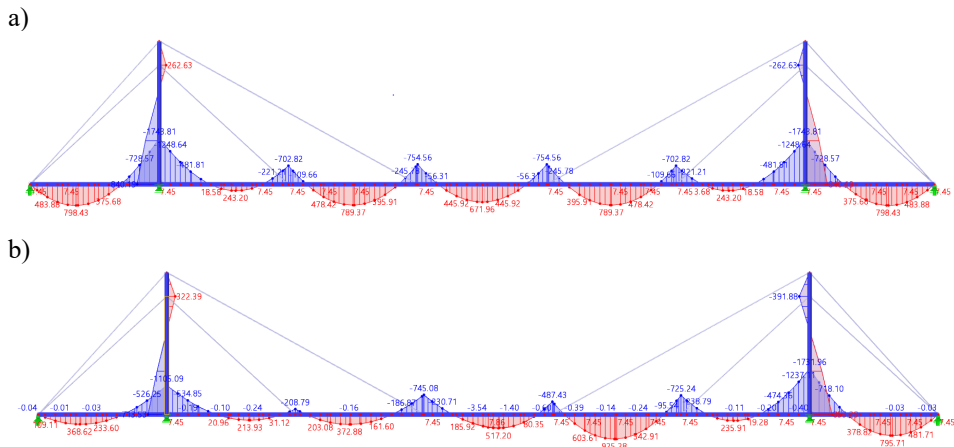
Cable-stayed bridge. Bending moments: a) under symmetrical loading and b) under asymmetrical loading (made by the author)
